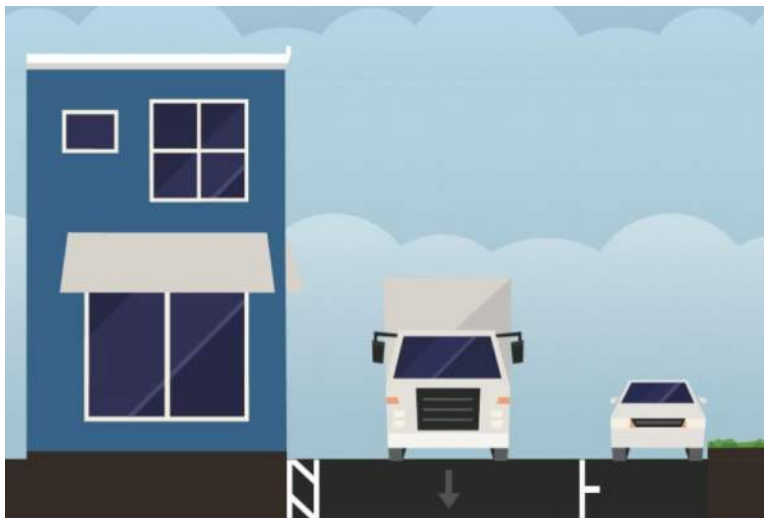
Existing Cross-section Looking West on E 1st Street (Source: www.streetmix.net)
